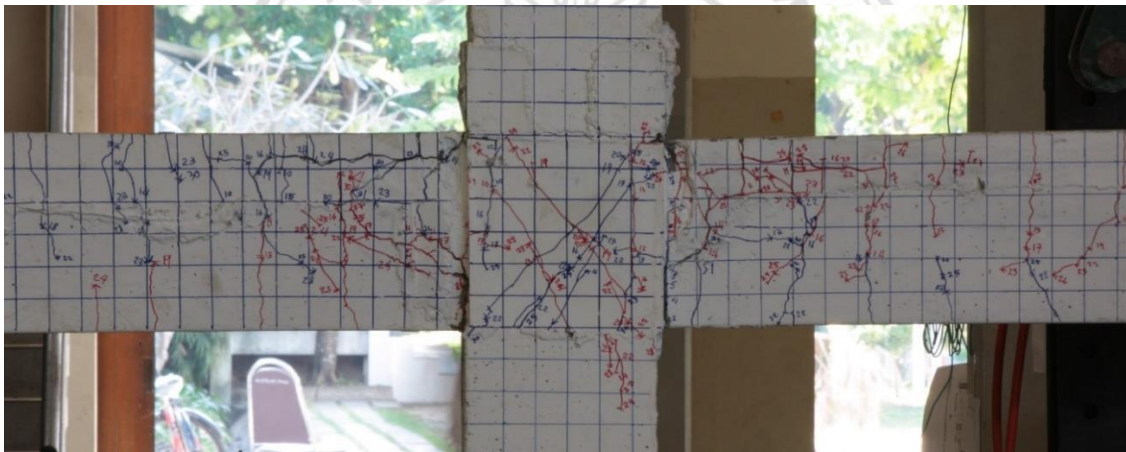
Crack distribution of precast specimen P1 at the end of testing
